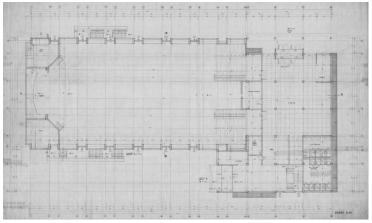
Elevation and plan drawings for the multi-purpose hall/sports facility.
